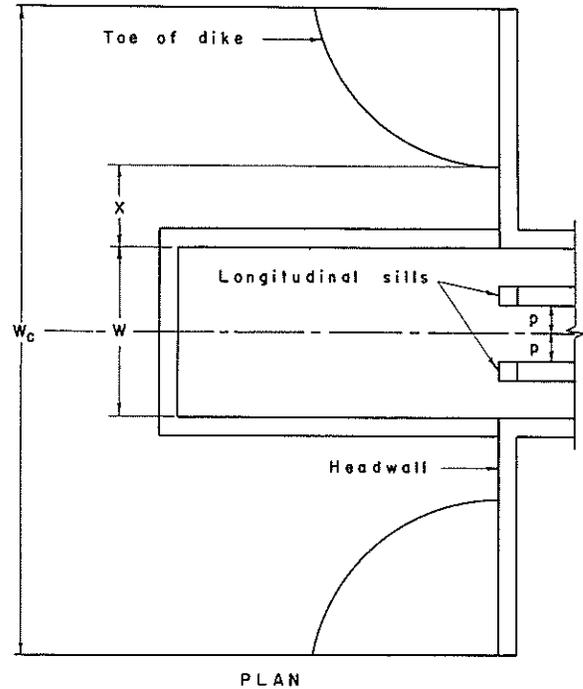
Construction of a box-inlet drop spillway.
